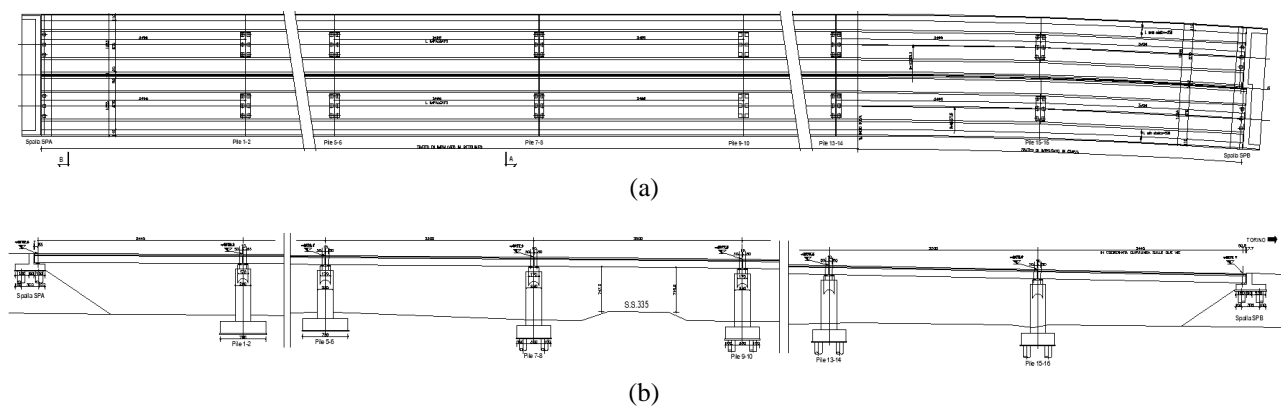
(a) Plan view and (b) elevation of the monitored bridge
